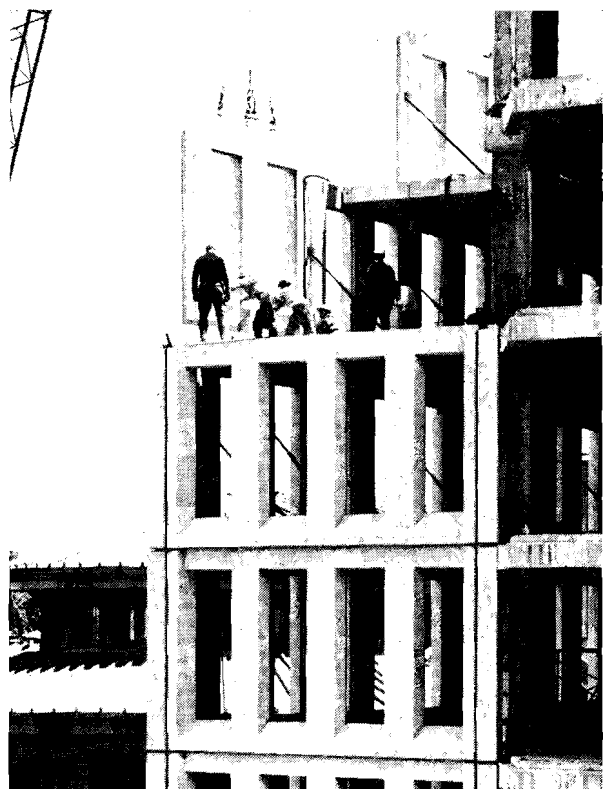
Window-wall panels used as outer bearing wall for precast floor units at McGill University Arts Building.
